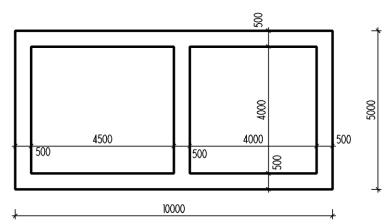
A model example of building - floor plan reinforced concrete foundations (Source: own)
